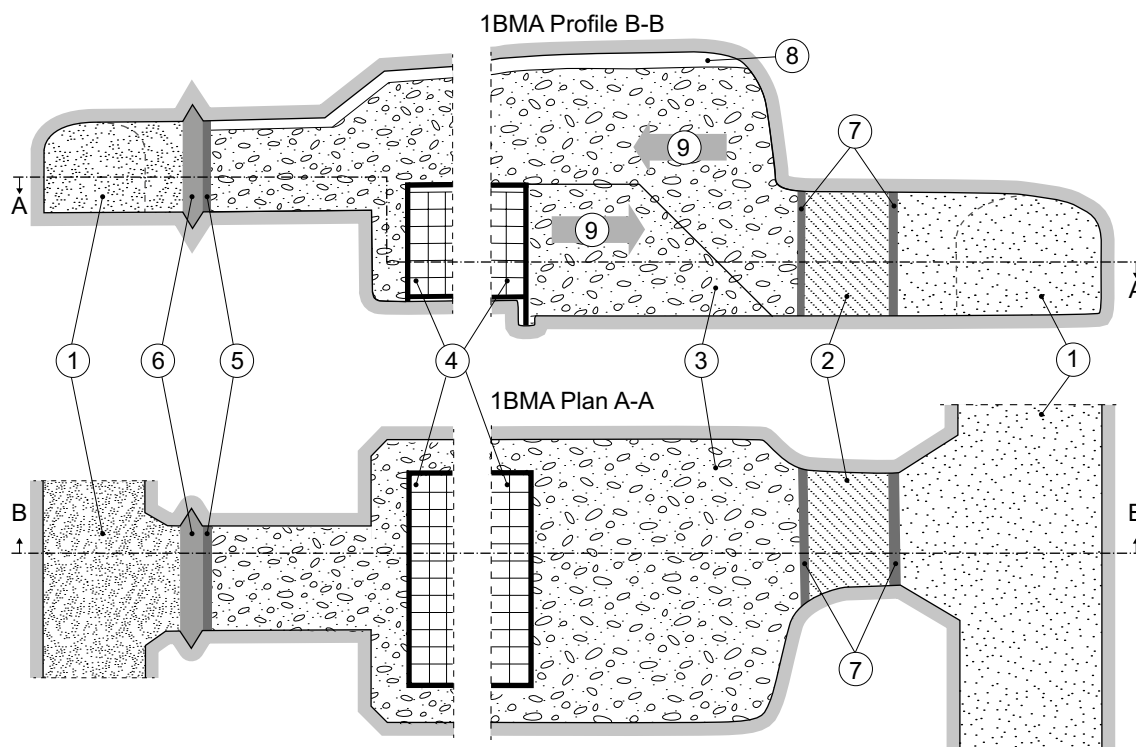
Schematic profile and plan of 1BMA after closure. Key to numbering: 1) Bentonite 2) Transition material, e.g. 30/70 mixture of bentonite and crushed rock 3) Macadam 4) Grouted waste packages 5) Constraining wall and concrete form 6) Mechanical plug of concrete 7) Constraining wall of concrete for transition material 8) Open gap between top surface of macadam and tunnel roof 9) Working direction for backfilling of waste vault.
